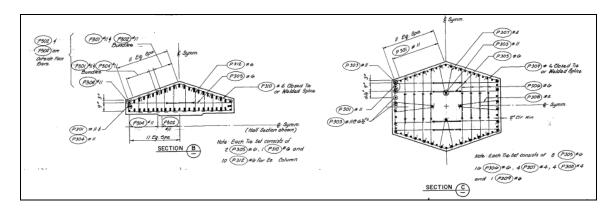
LL Pier 3 Transverse View – drawing 289
